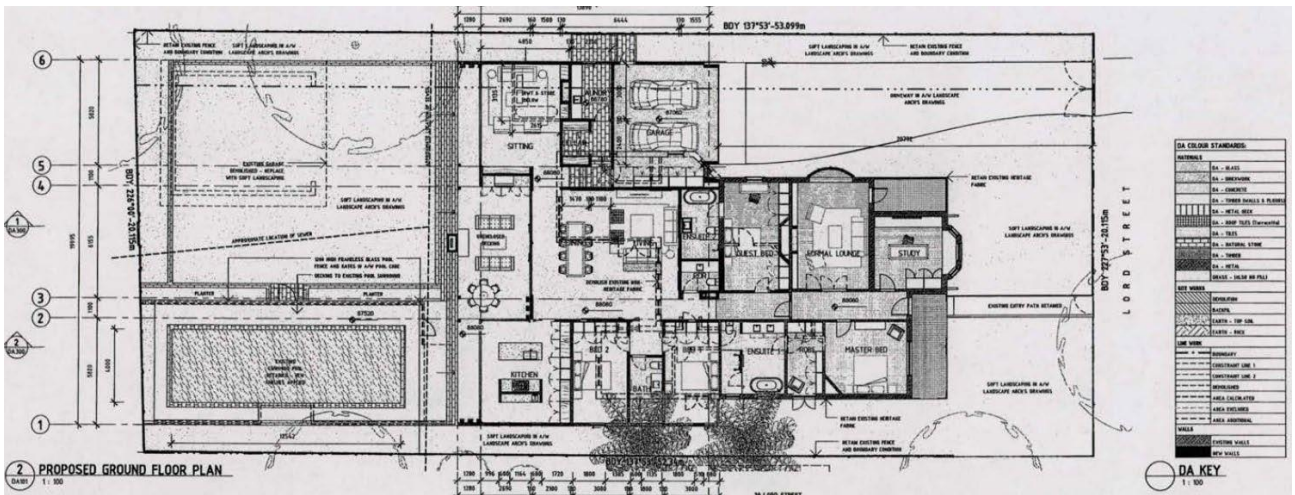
Floor plan showing extent of proposed alterations and additions dated from 2015
